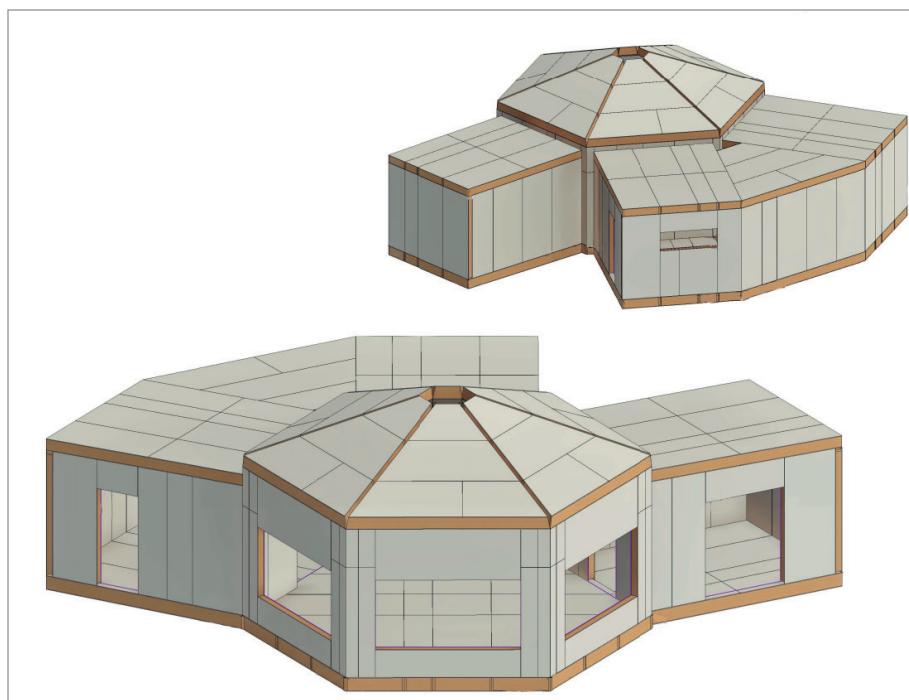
A STRUCTURAL MOCK-UP ILLUSTRATES THE USE OF SIP PANELS TO FORM THE ENTIRE BUILDING'S ENVELOPE INCLUDING FLOORING, WALLS, AND ROOFING. | ZS2 STRUCTURAL DESIGN PACKAGE FOR KUUGALAK BUILDING. ON FILE AT PI/KHS ARCHIVES.
